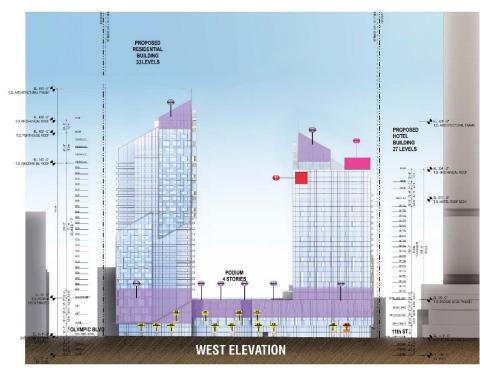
Alternative A Sign Dimensions and Locations – West Elevation
